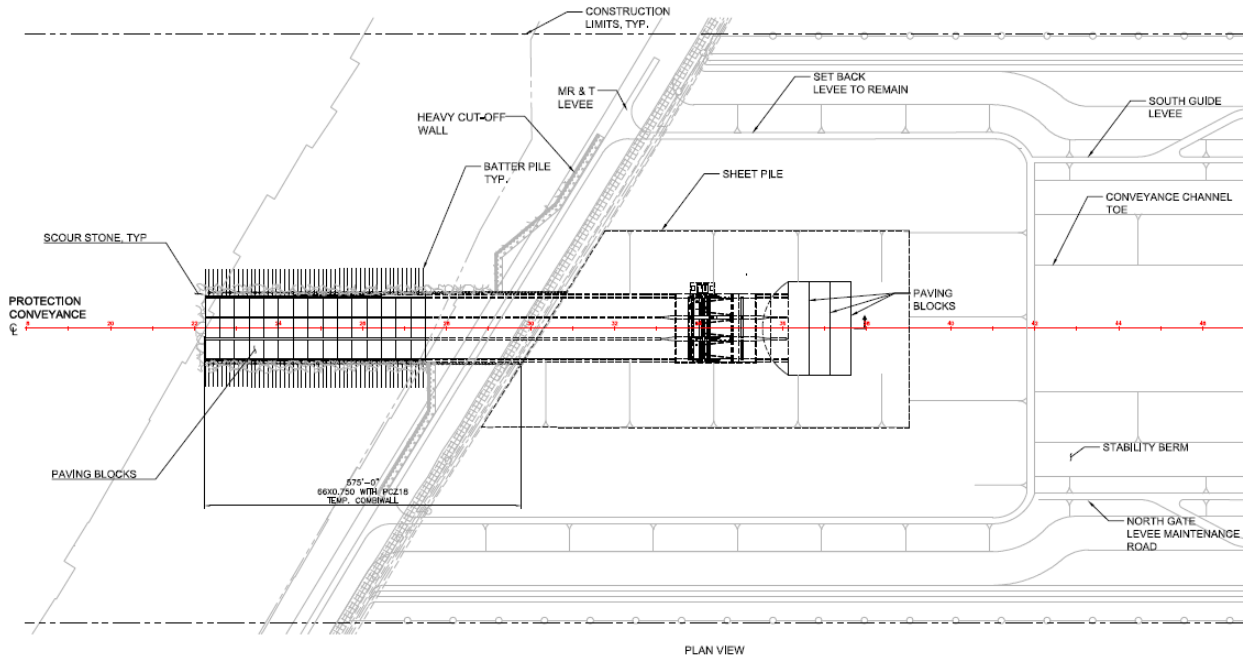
Alt. A – Construction Stage Plan View of the Inlet/Approach Channel, Control Structure & Transition to the Conveyance Channel, Showing the Sheet Pile Limits of the Glory Hole
